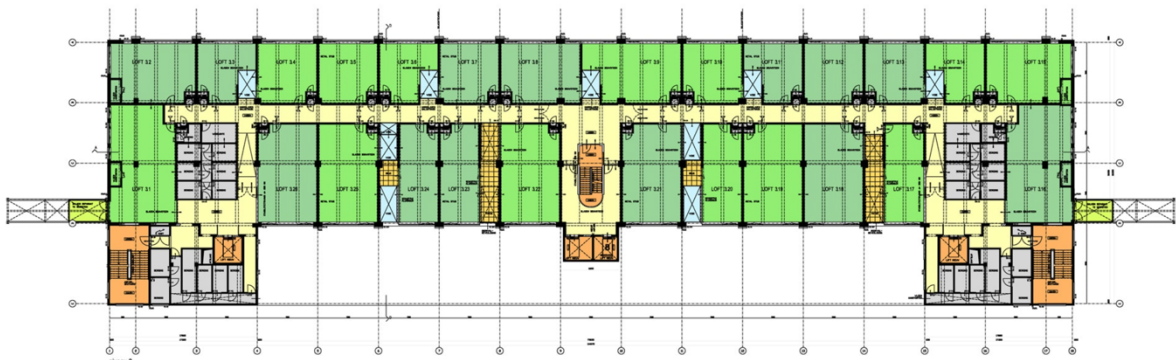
Renovation floorplans of Gerard (Jo Coenen & Co Architecten, 2013)
